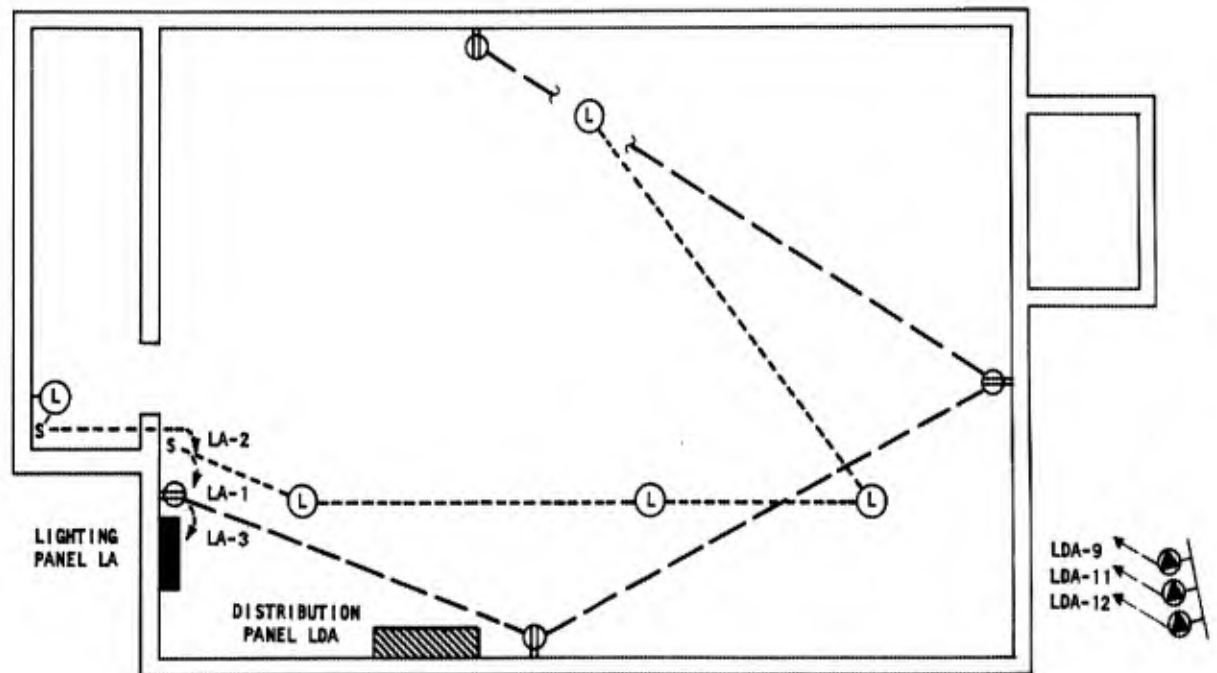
LF Support Building Lighting and Receptacle Plan
